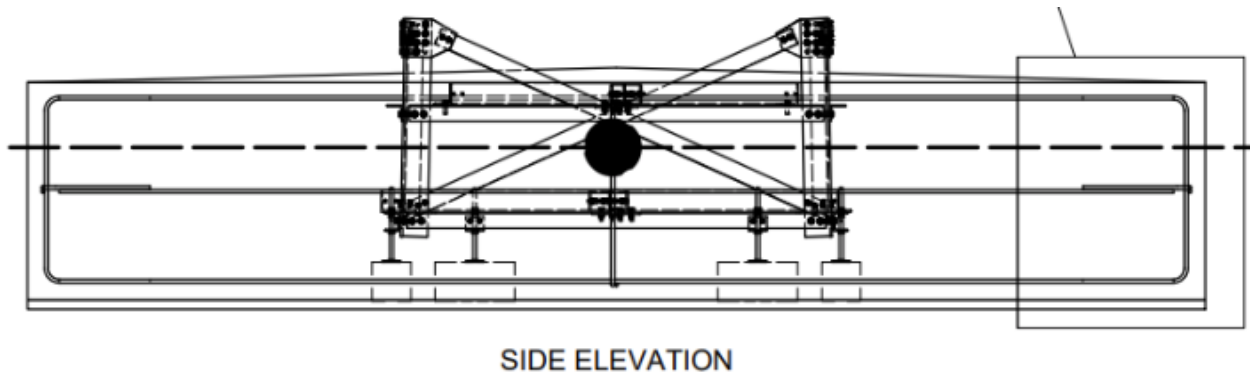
Extract from typical foundation drawing showing elevation of Base Grillage in concrete.
